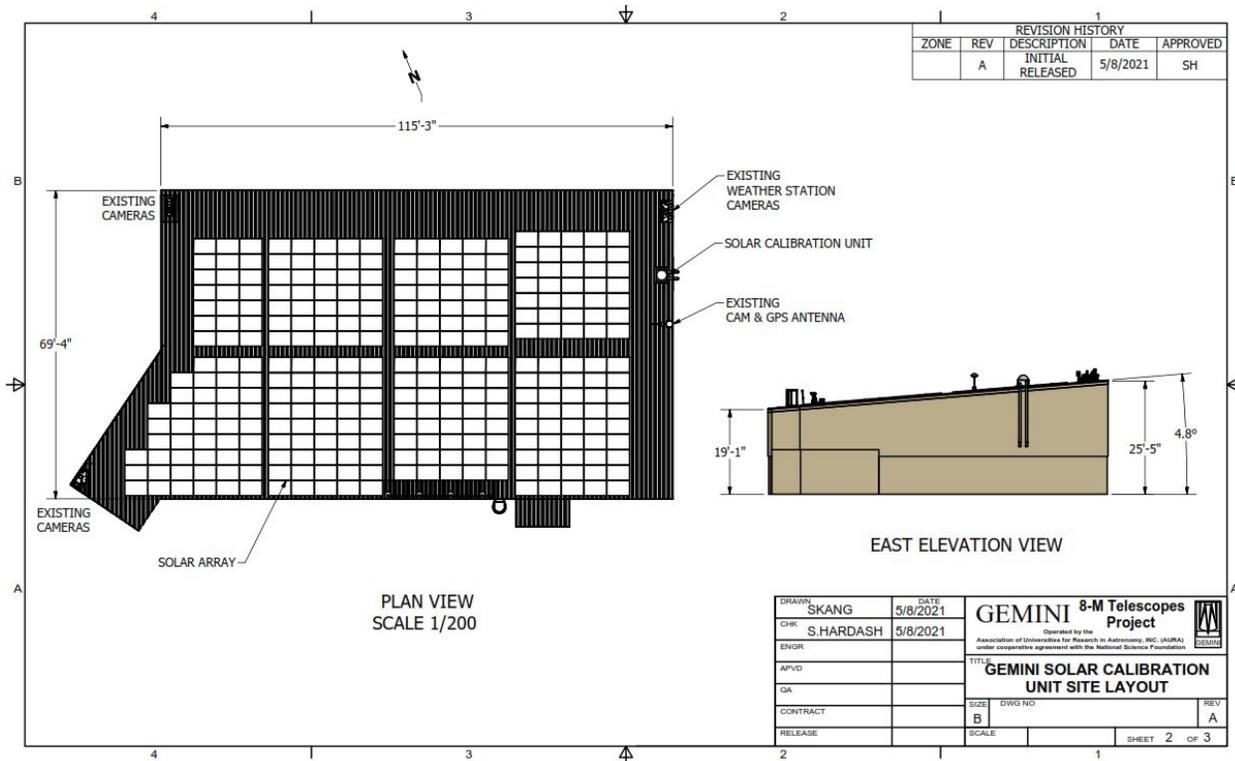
Plan view and elevation view of the Gemini Support Facility showing location of the proposed solar calibration unit.
